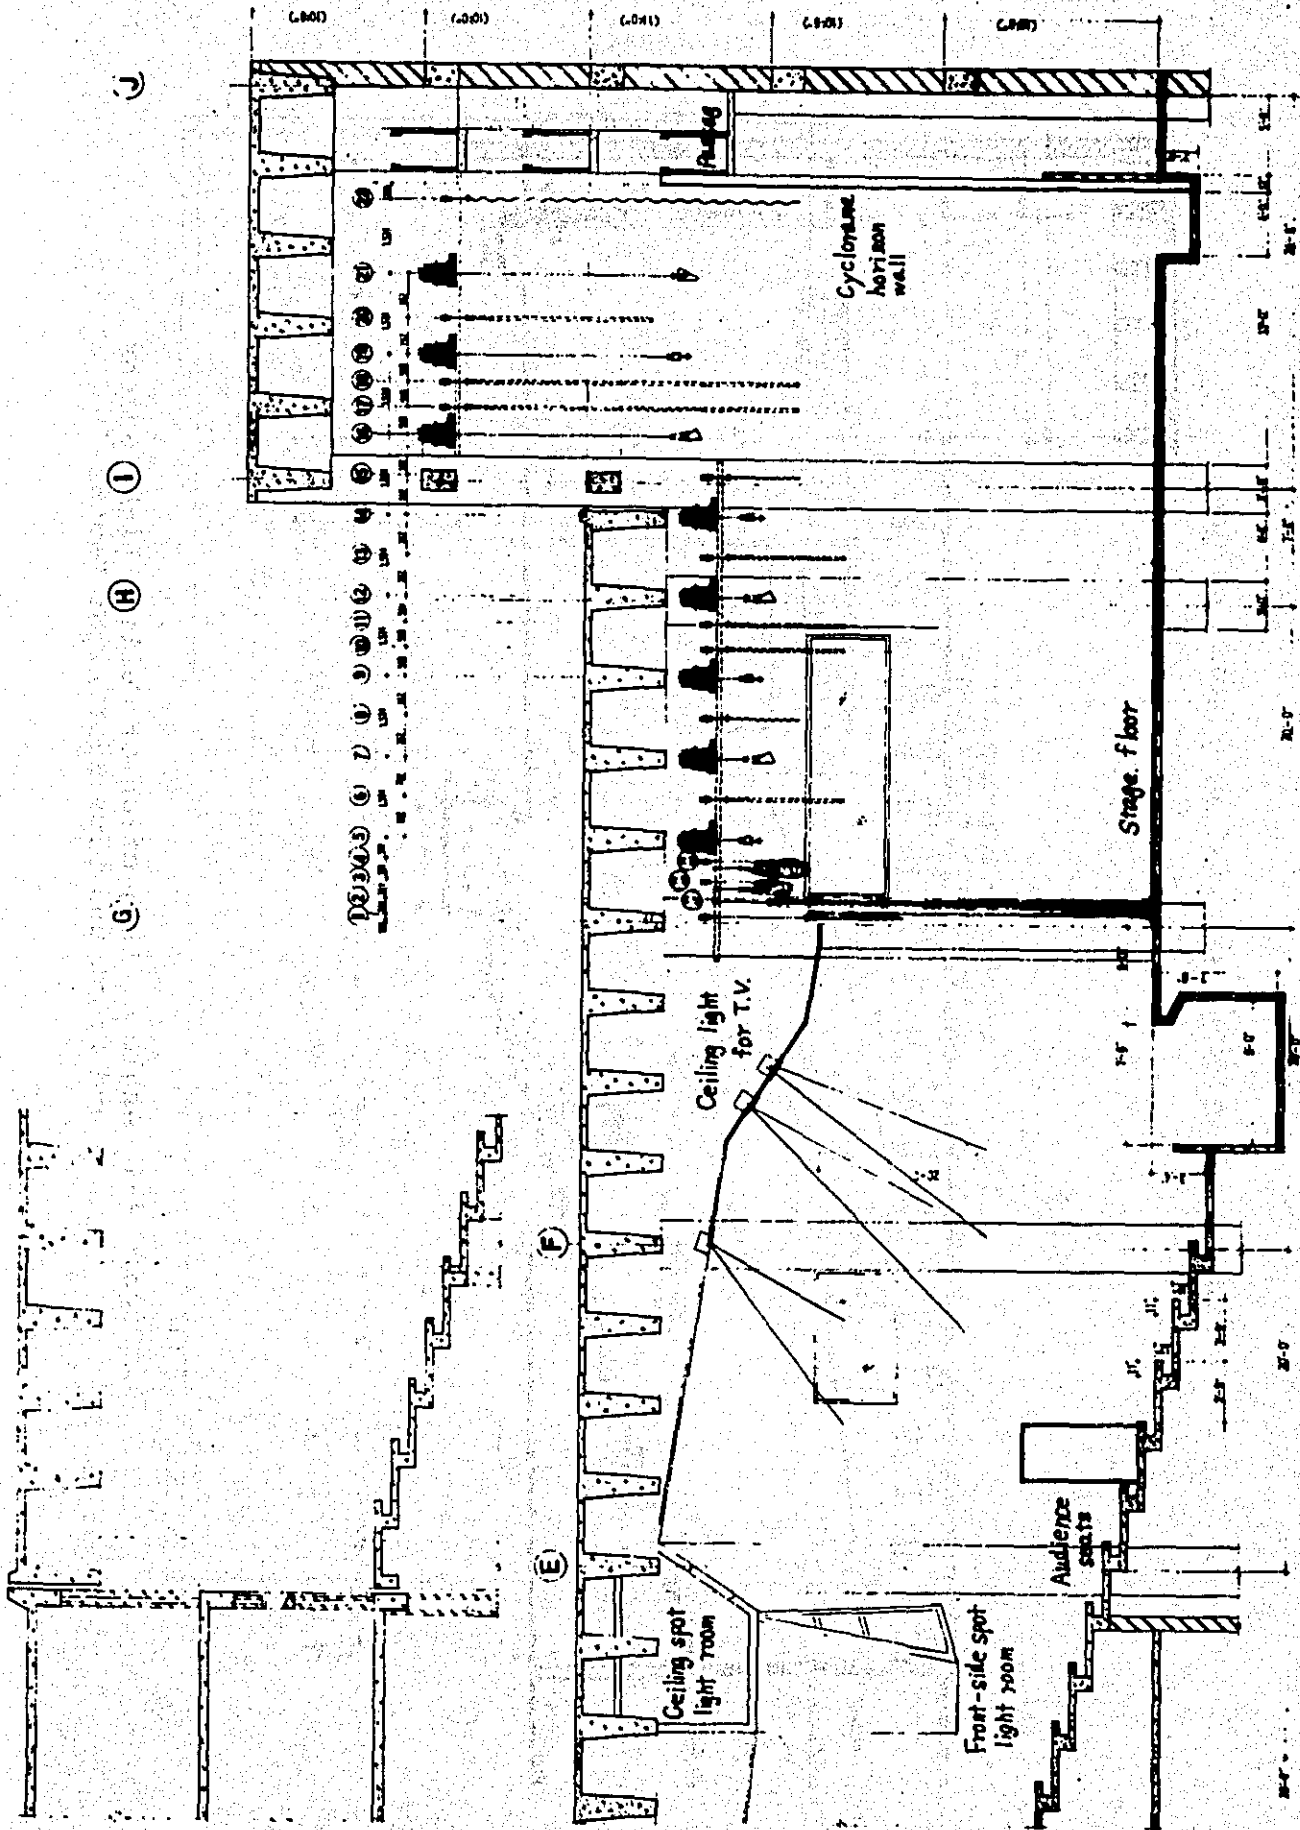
Cross-Sectional View of Arrangement of Lighting and Art Facilities
